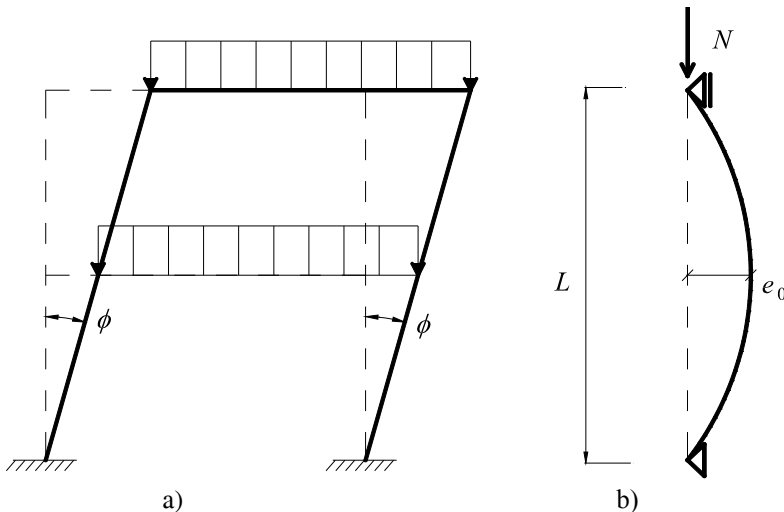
a) Global frame imperfections; b) Local member imperfections
